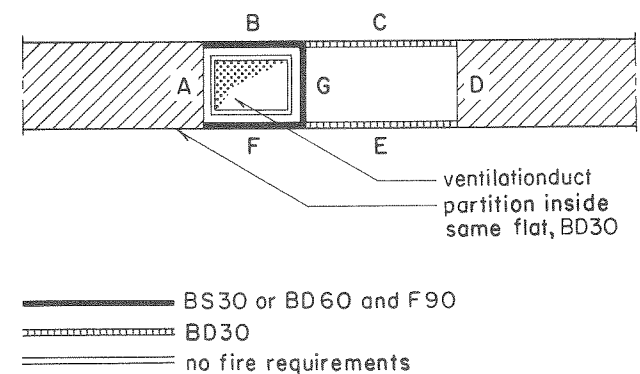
Pipe space service unit inside same flat; fire requirements at multistorey dwelling houses
